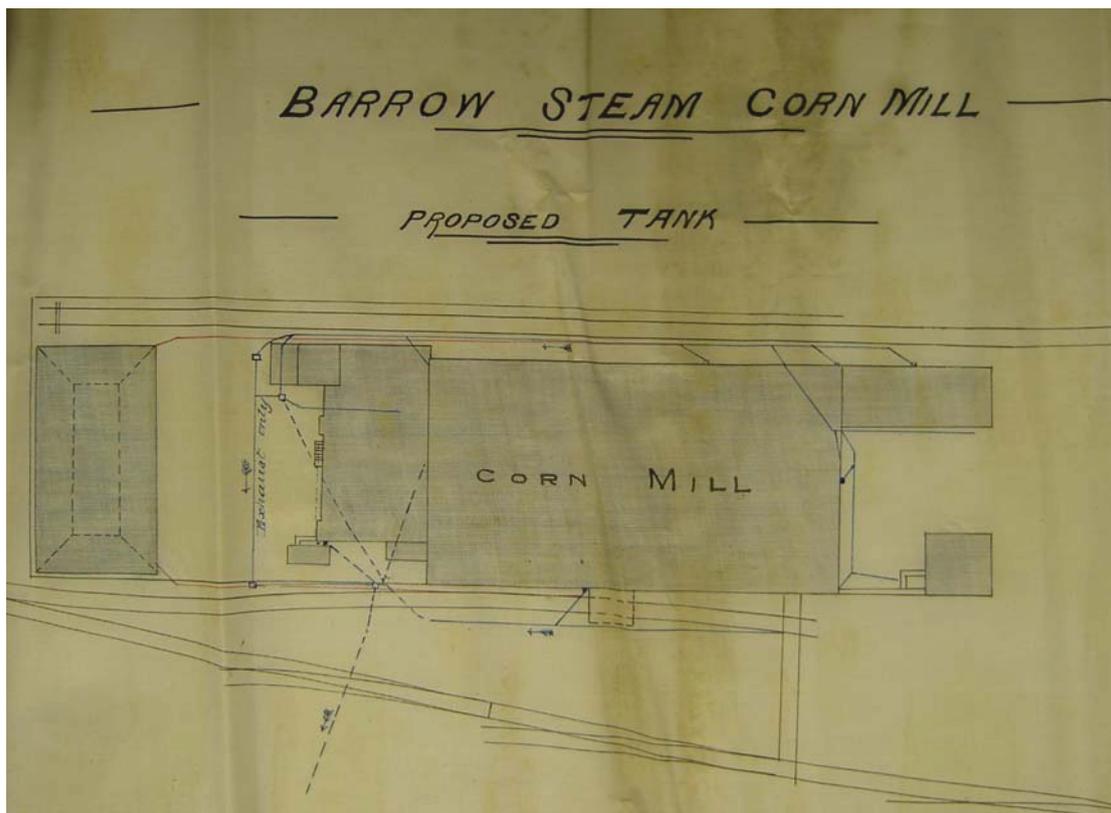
Undated plan of the corn mill (Site 09) and proposed water tank (after CRO(B) Z3198 n.d.)
